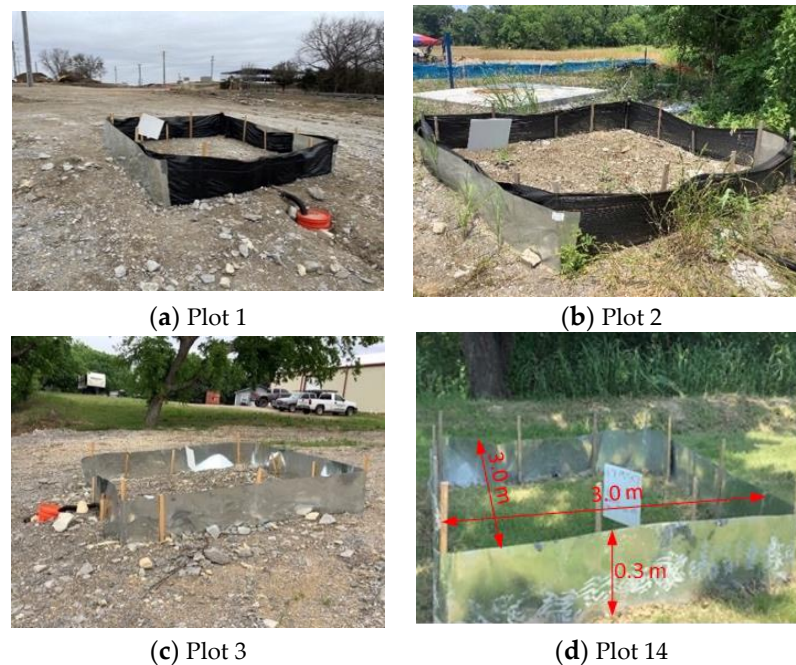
Erosion plots installed at the Wilson Creek bridge construction site (all plots were 3 m × 3 m × 0.3 m).
